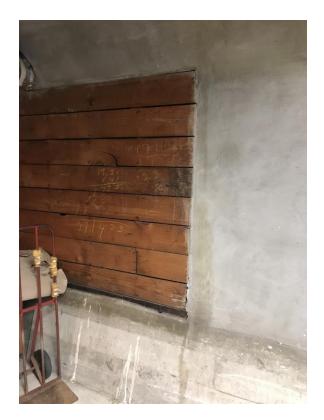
Southeast Corner of Utility Space with Stucco and Straight Sheathing
